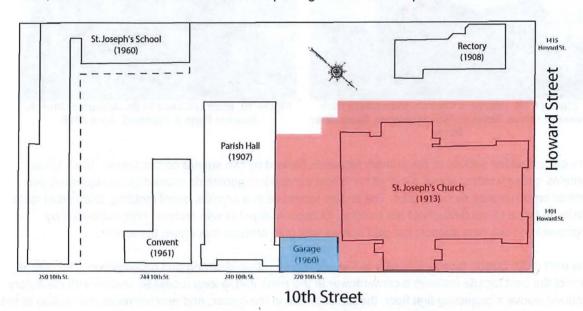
Site plan of the former St. Joseph's Church complex. The parcel on which the church is located (APN 3517/035) is shown in red. The rectory, parish hall, convent, and school buildings are no longer associated with St. Joseph's Church. The garage has since been demolished, and the parcel (APN 3517/036) is now associated with the subject building, shown in blue.
